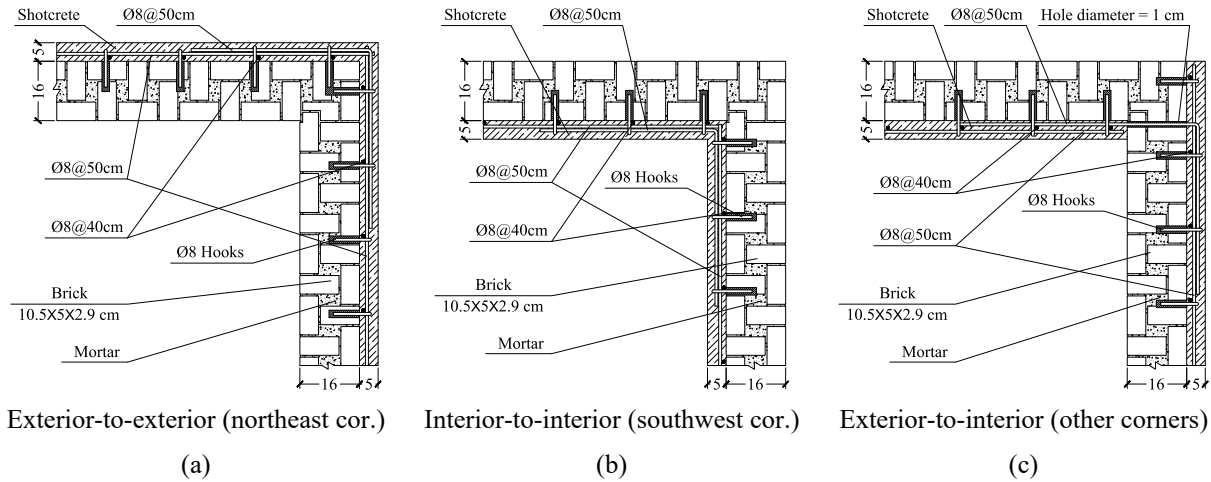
Plan view of wall-to-wall connections (dimensions are in cm)
